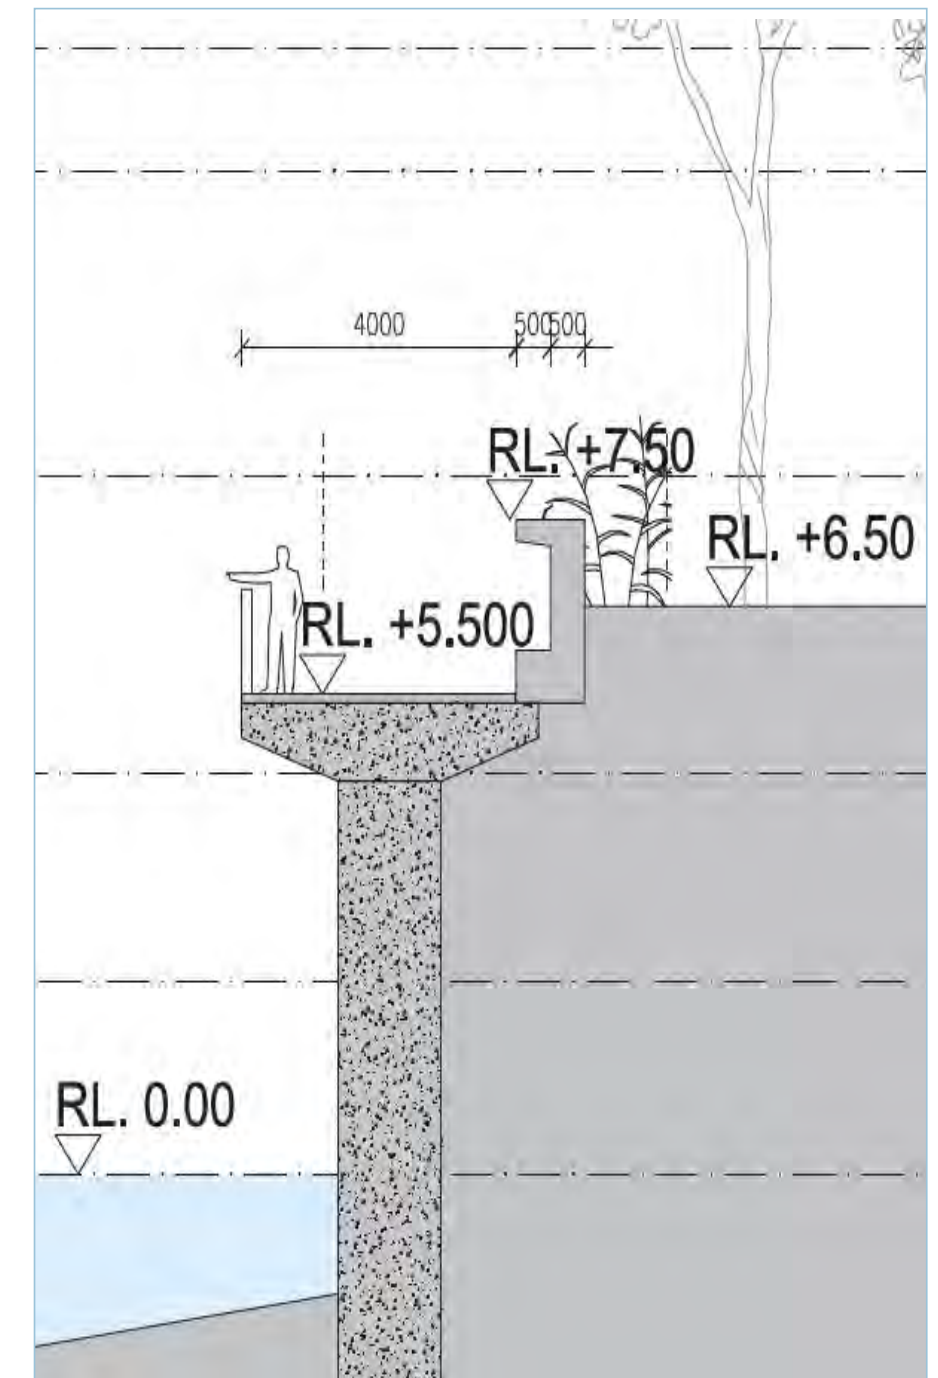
CROSS-SECTION OF THE DEFENCE WALL
